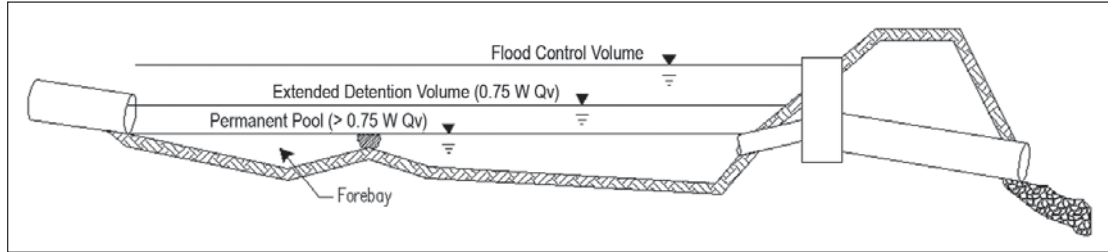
Wet Storm Water Pond with Extended Detention and Flood Control Volumes
